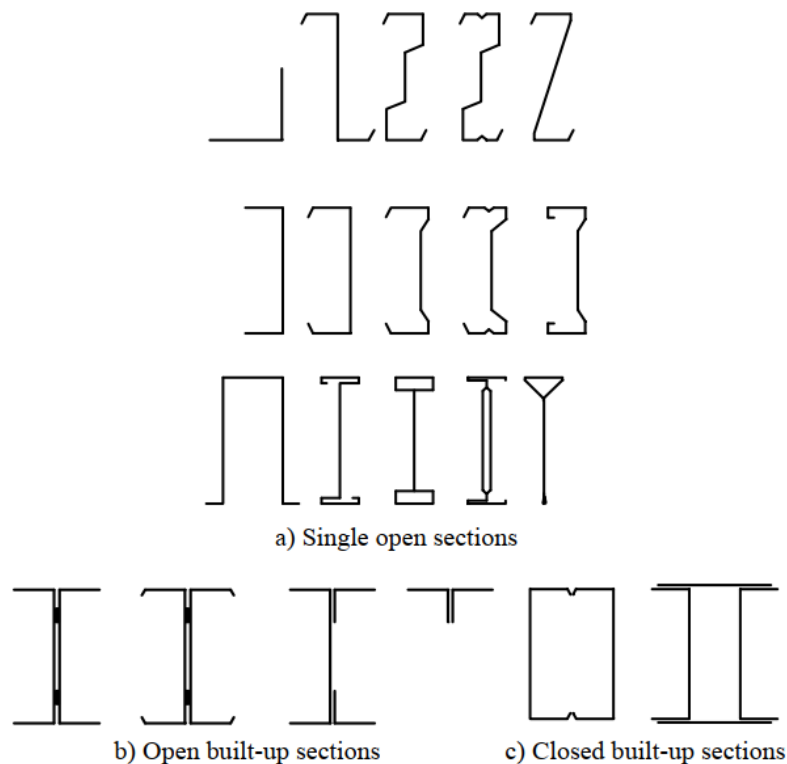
Typical forms of sections for cold-formed structural members (Dubina et al., 2013).
